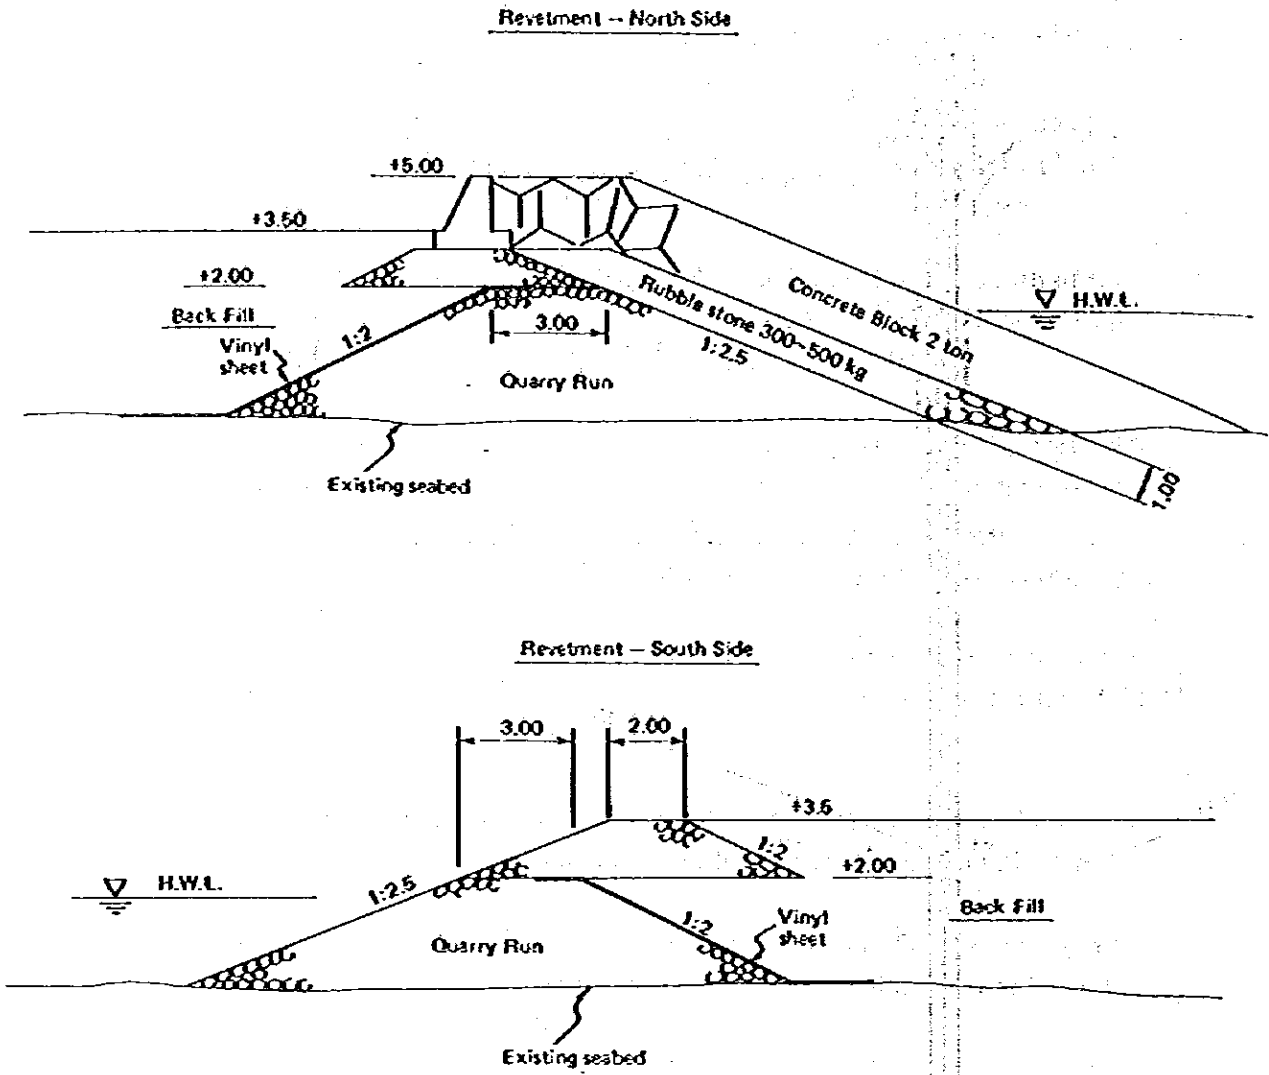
Typical Cross Section of Revetment (Wharf Type)
